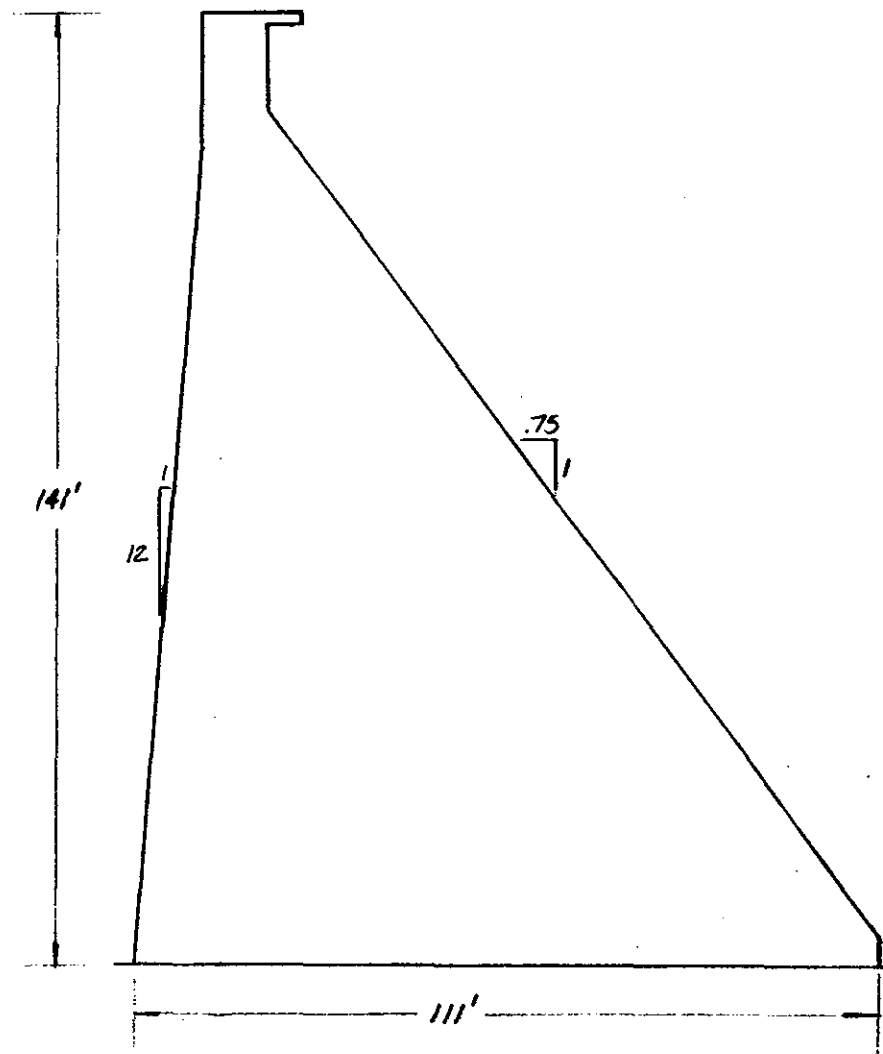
Trumbull Pond Dam - Section at Station 3+20
